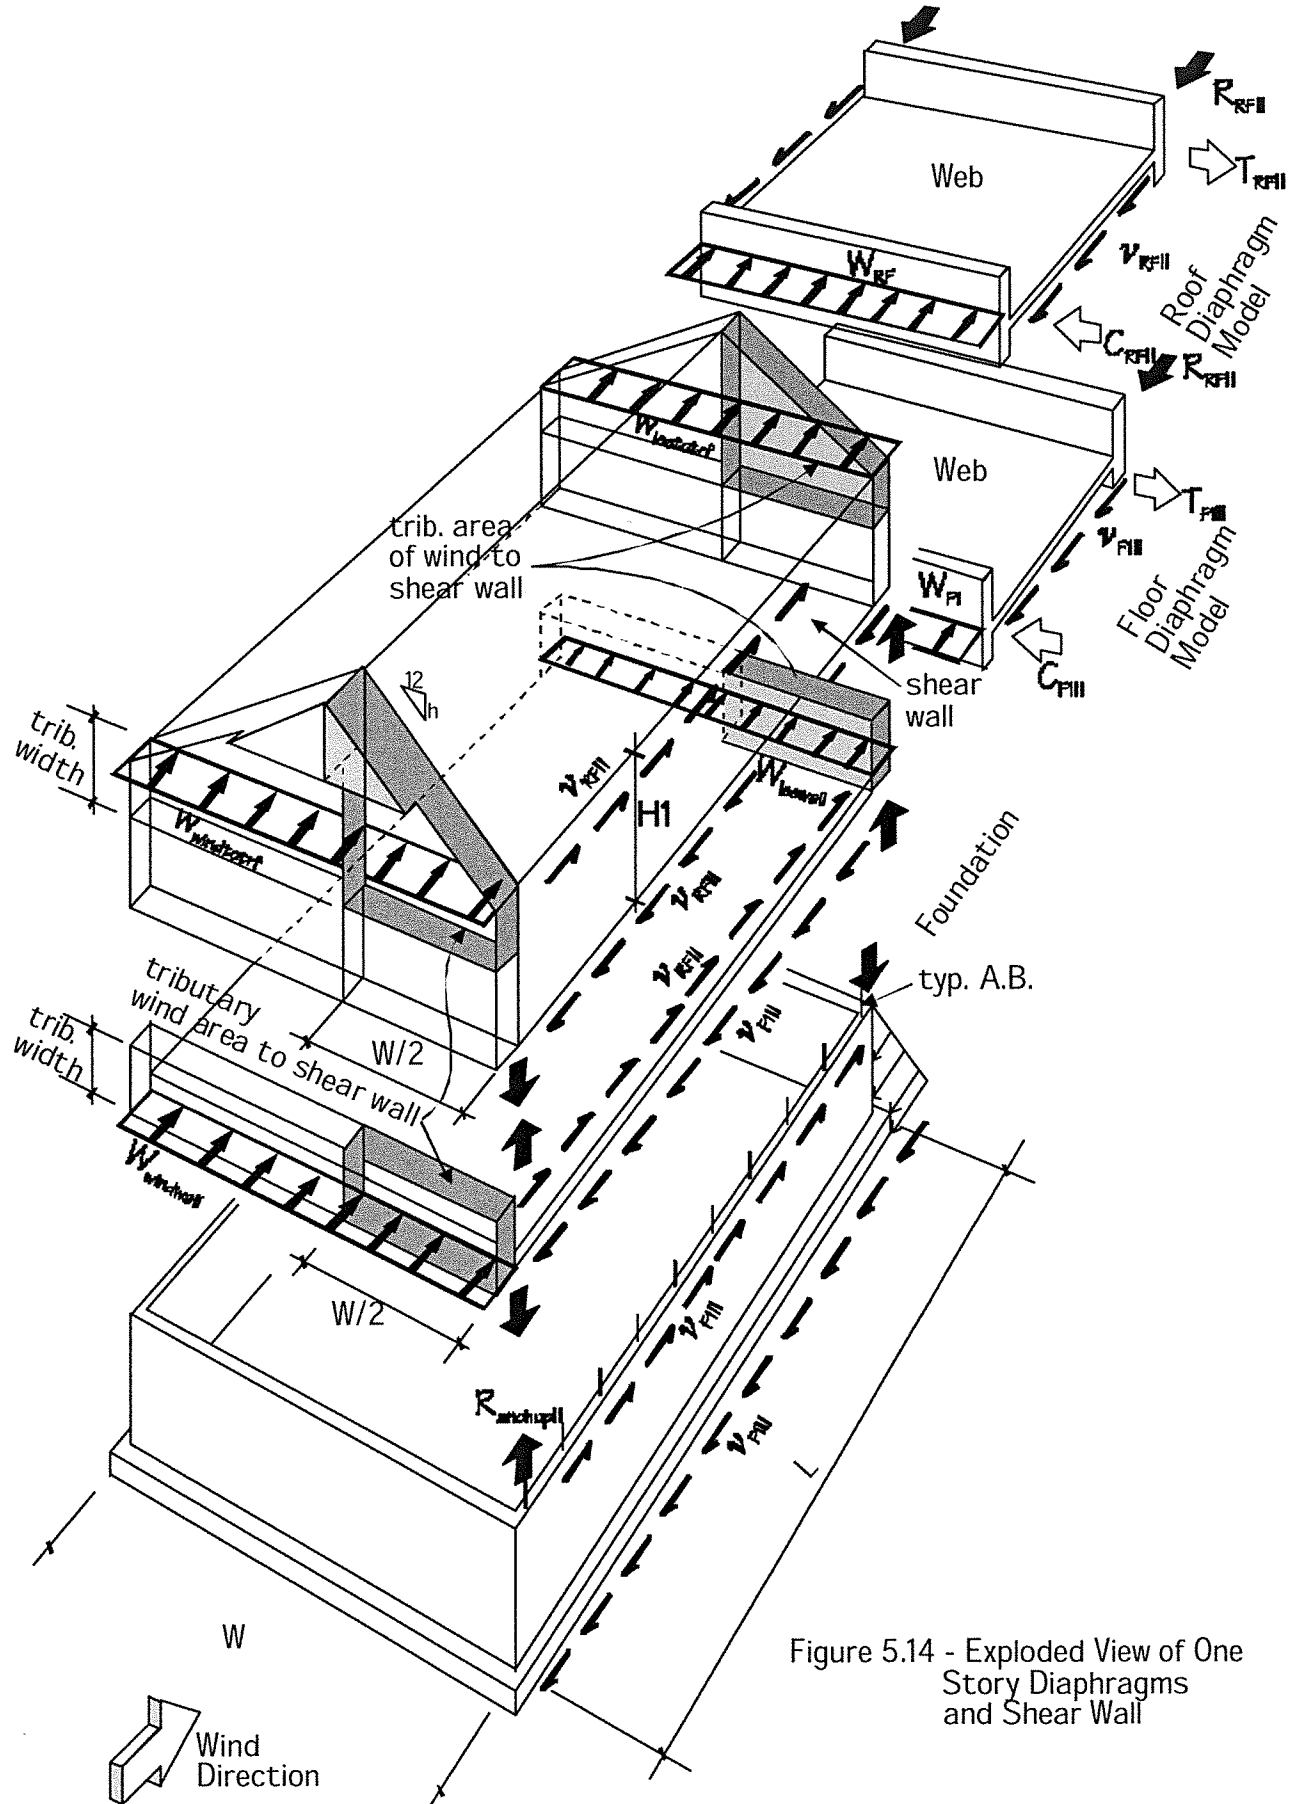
Exploded View of One Story Diaphragms and Shear Wall
